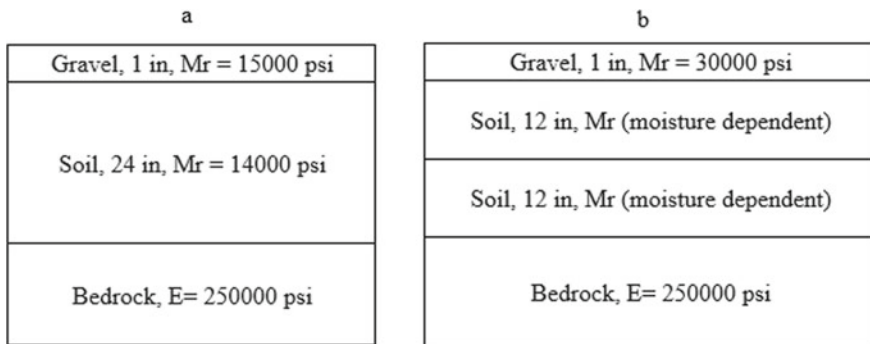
Pavement cross section a before wicking fabric, b after wicking fabric
